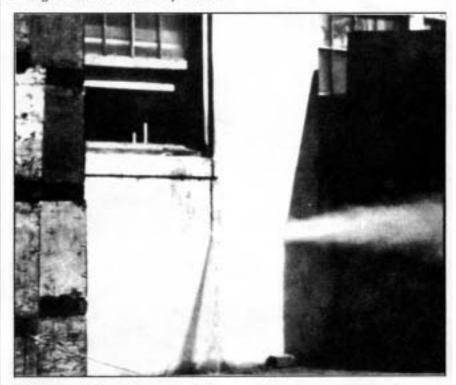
Cutting a hole in a wall. Photograph courtesy of Bill Hall.
